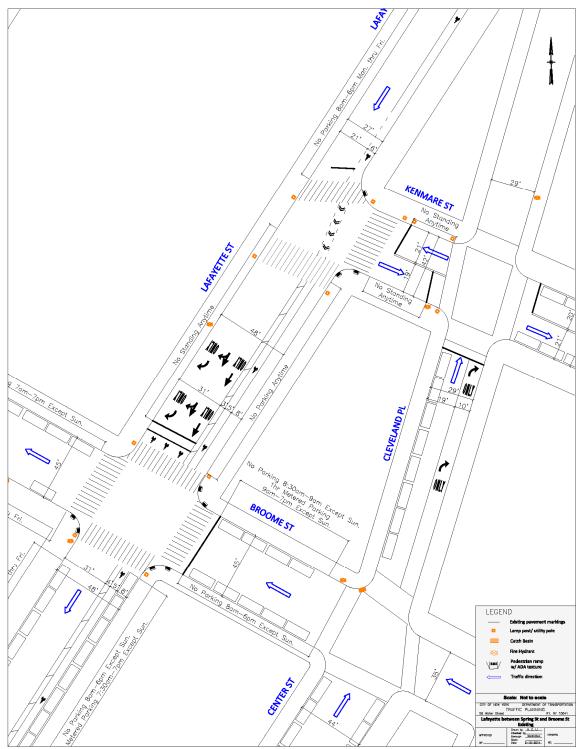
Lafayette St @ Kenmare St/Broom St – Existing Conditions
